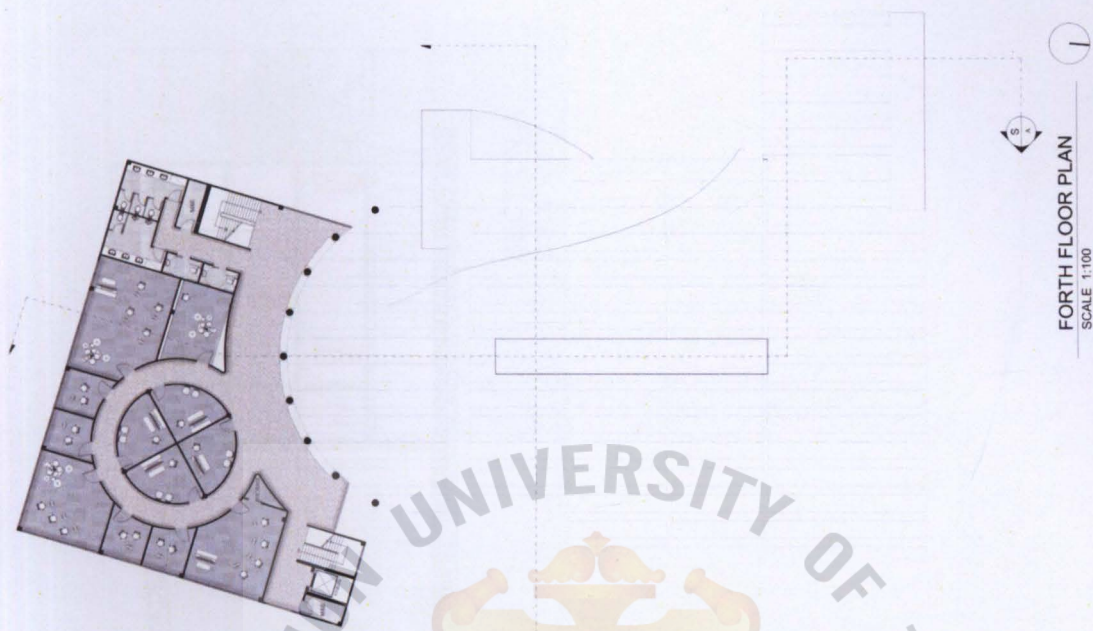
FORTH FLOOR FURNITURE LAYOUT PLAN
